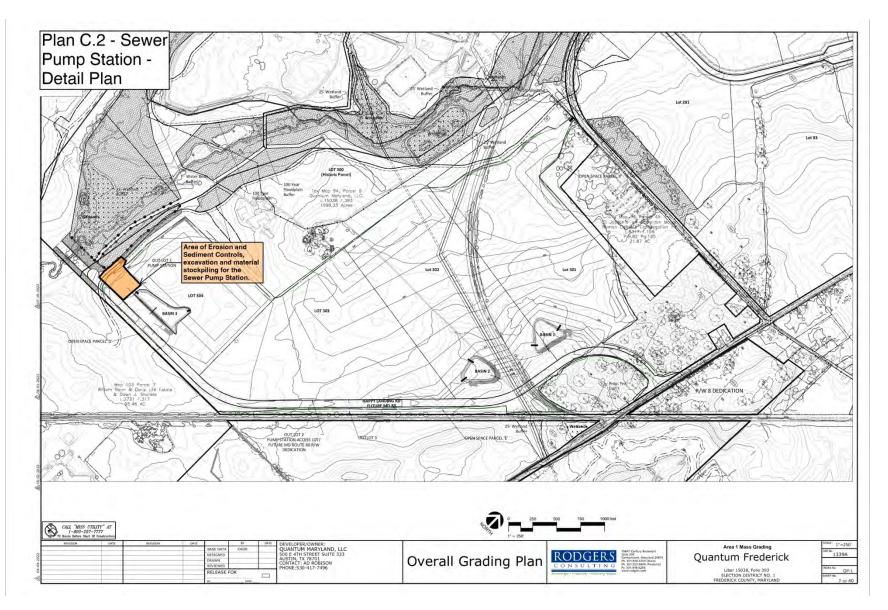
Sewer Pump Station Excavation – 05/30/2023
